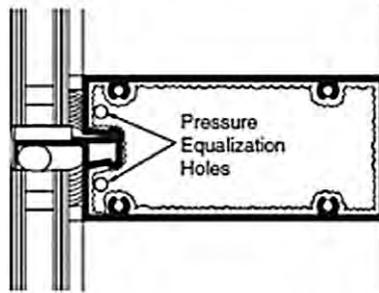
Kawneer Series 2500 PG unit wall architectural details, 2008
